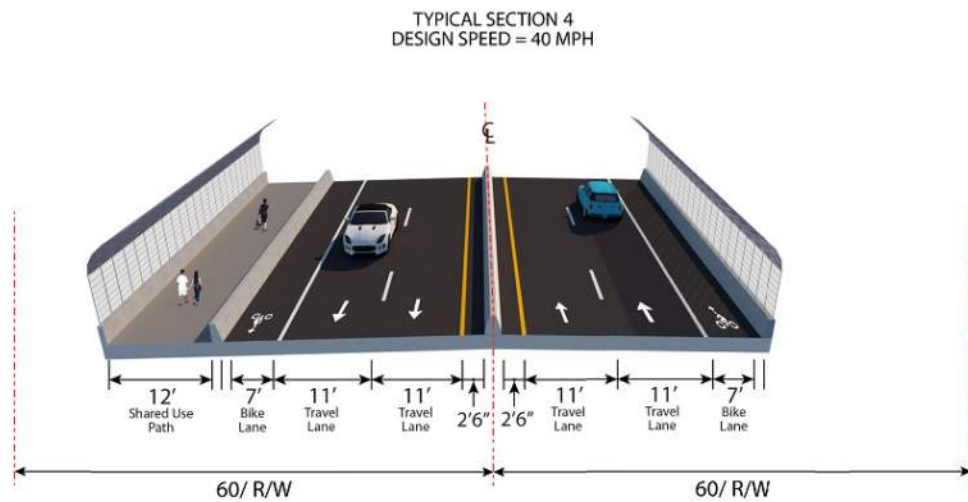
Four-lane Elevated Typical Section along N. Cattlemen Road
